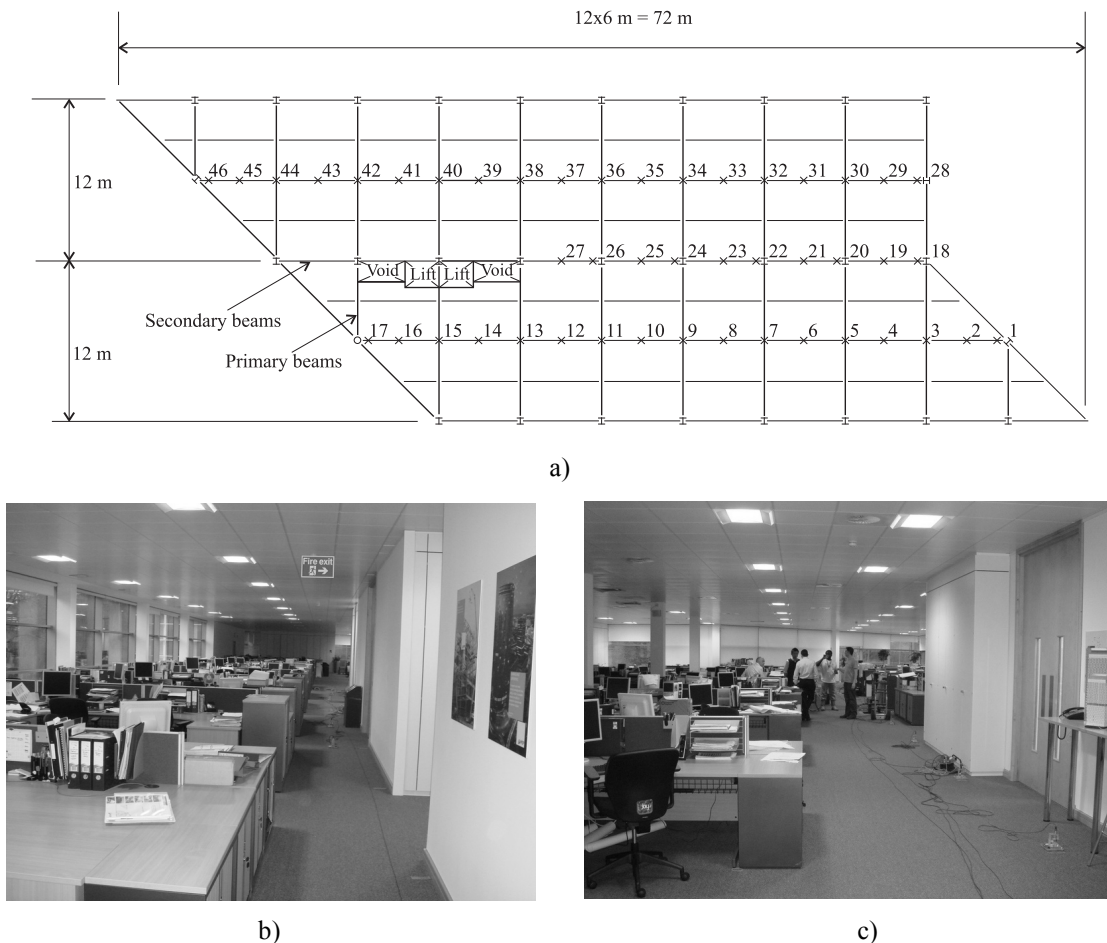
Test structure. a) Plan of the floor (not to scale); (x) measurement point used in the EMA. b) View from TP 44 towards TP 28. c) View from TP 12 to TP 01.
